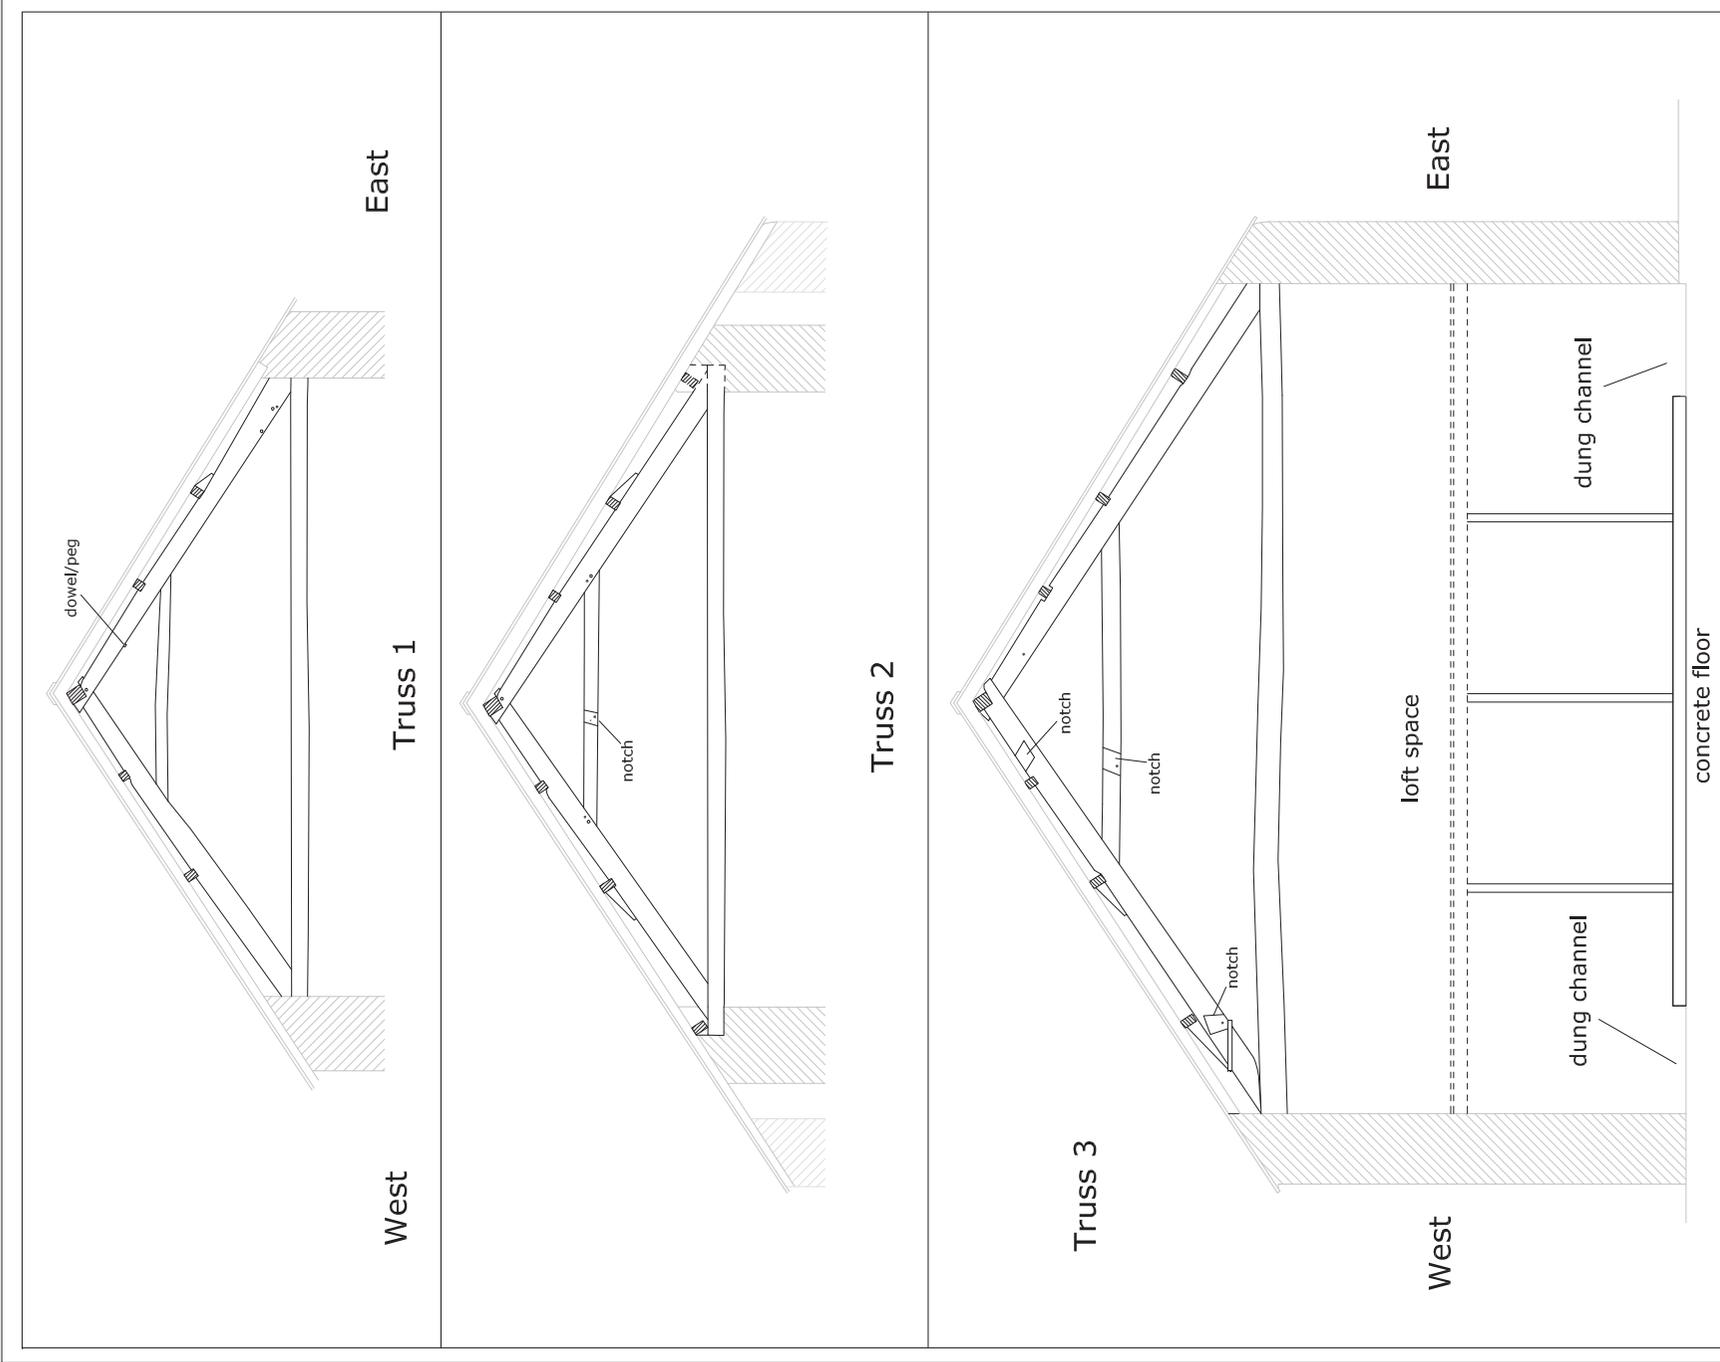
Trusses 1-3 (south-facing sections) including barn cross section
